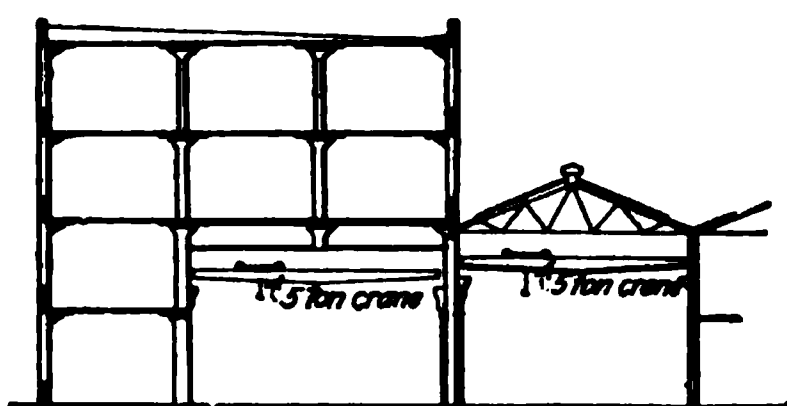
Cross section of reinforced concrete machine shop with high crane bay.
